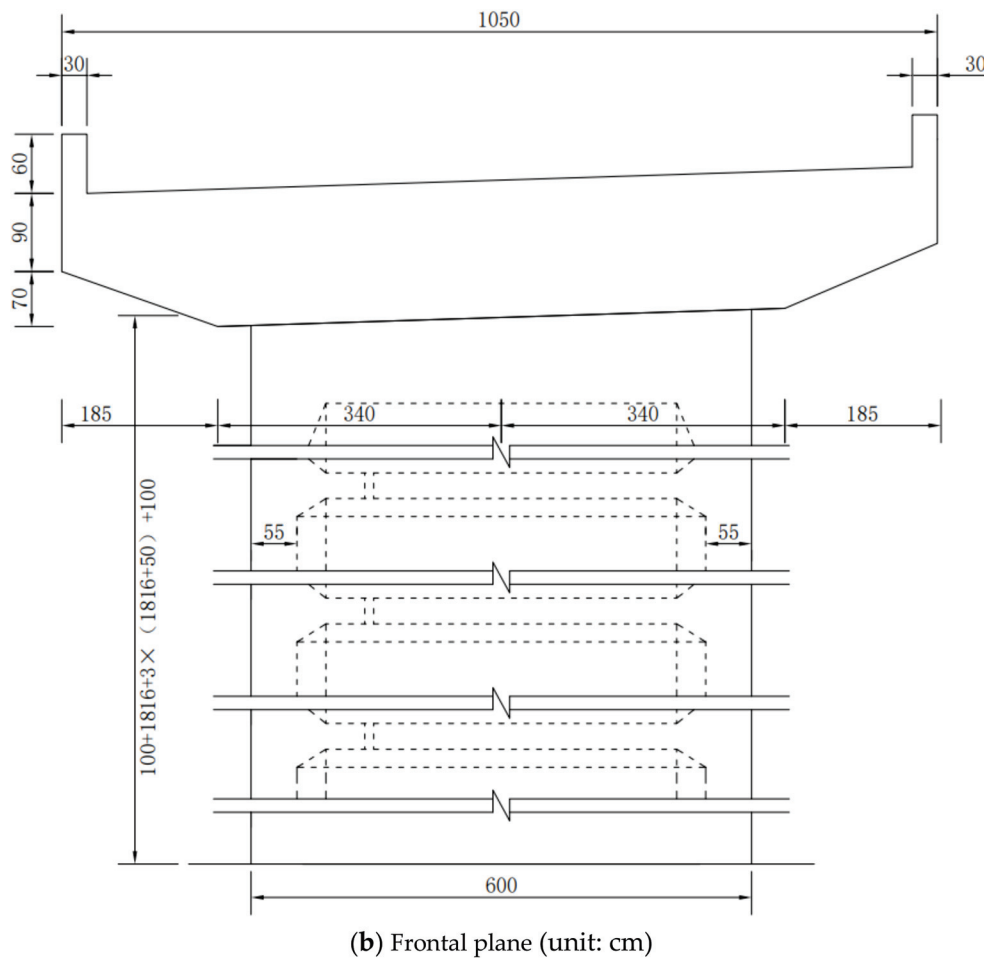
Pier No. 5 structural design drawing (frontal plane) (unit: cm).
